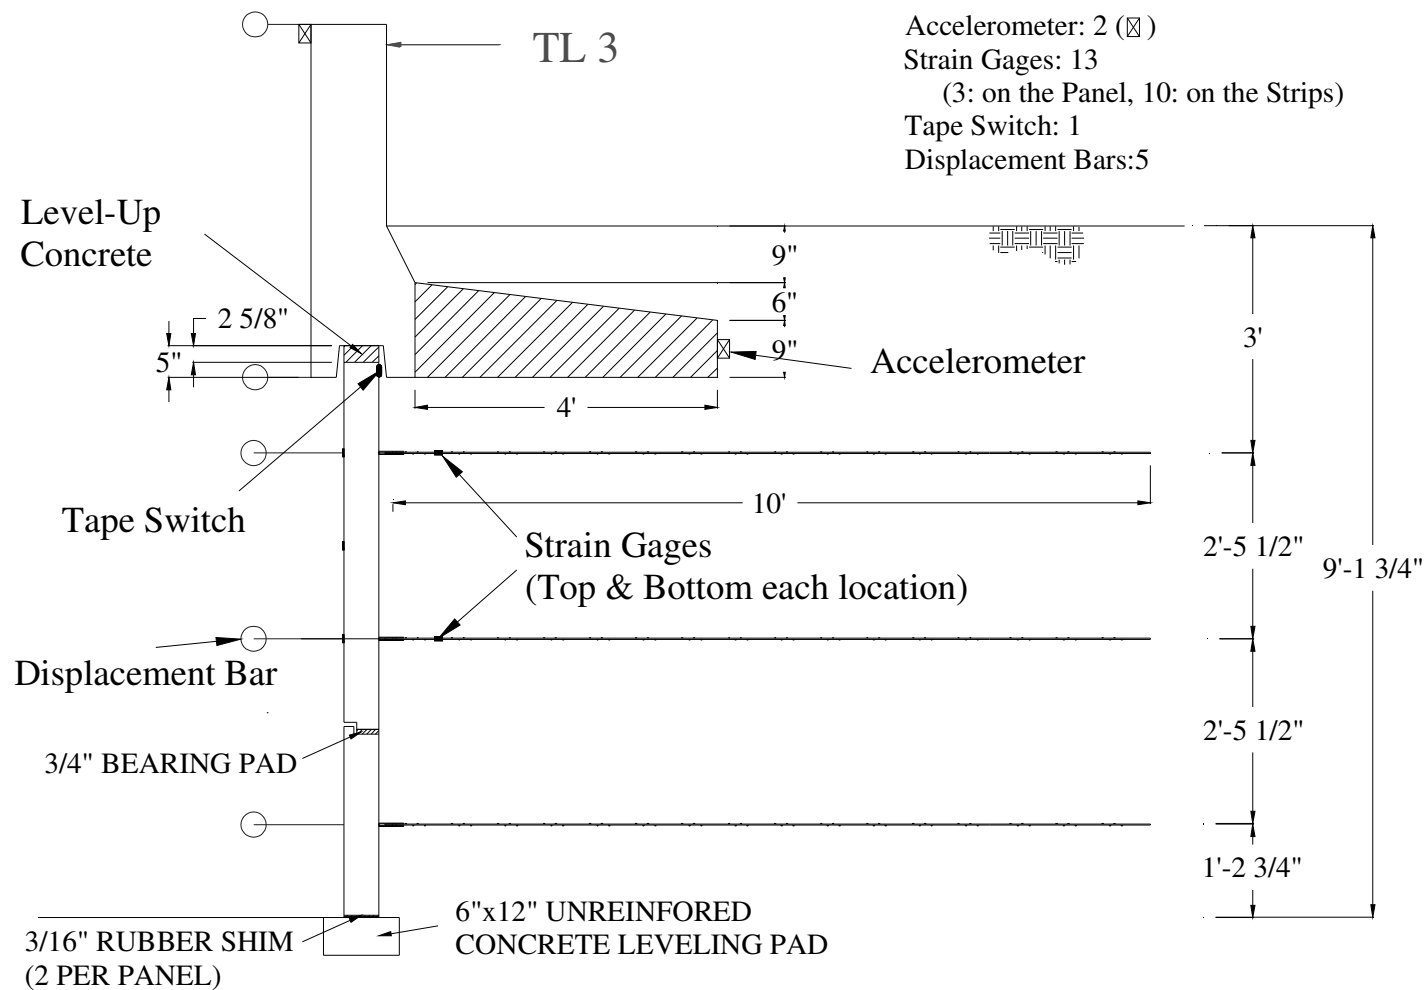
Side View of TL-3 Crash Test with 32-in. Tall Vertical Wall Barrier Parapet
